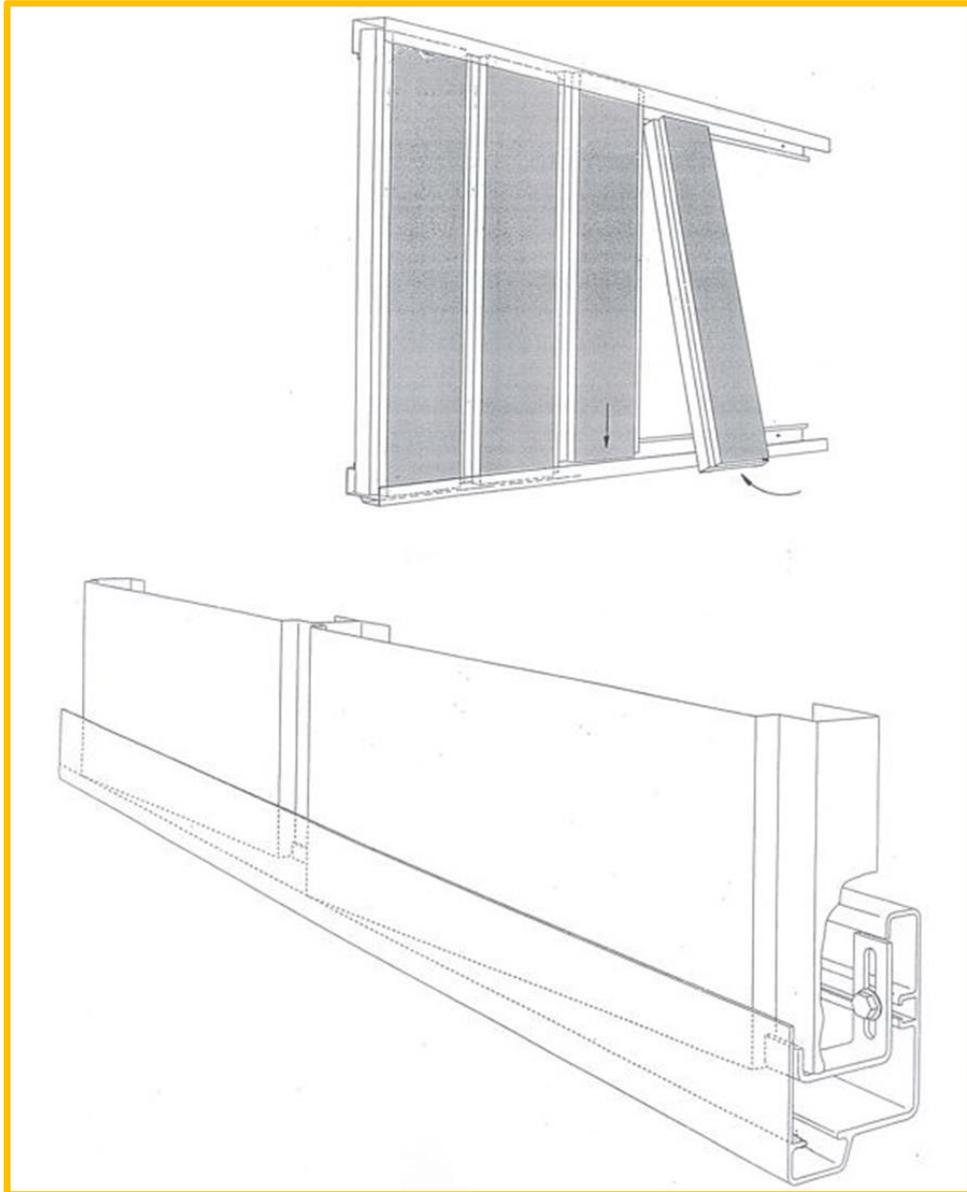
Details of the installation of absorbent claddings with lightweight panels
